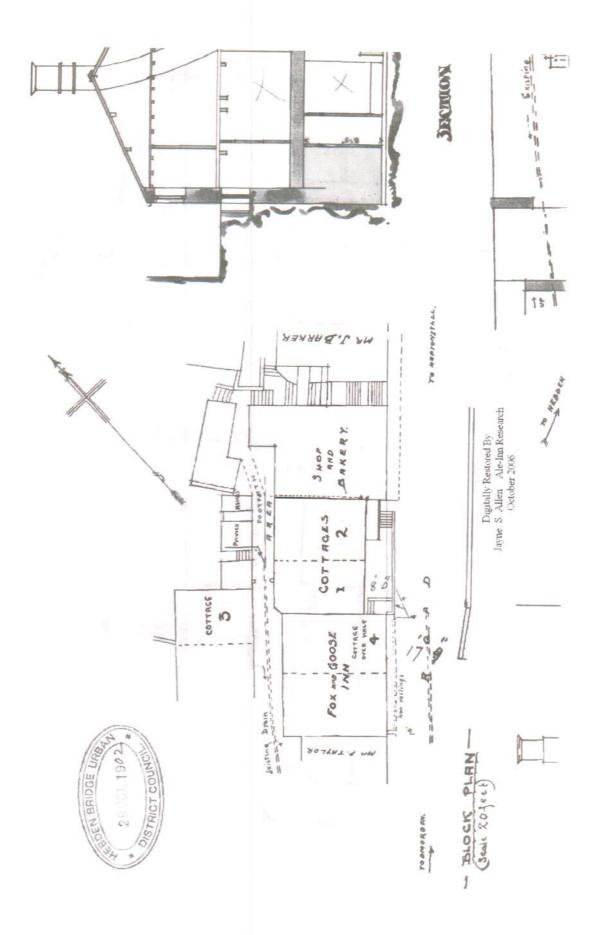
1902 remodelling. Walshes proposed plan of the site after the remodelling.
